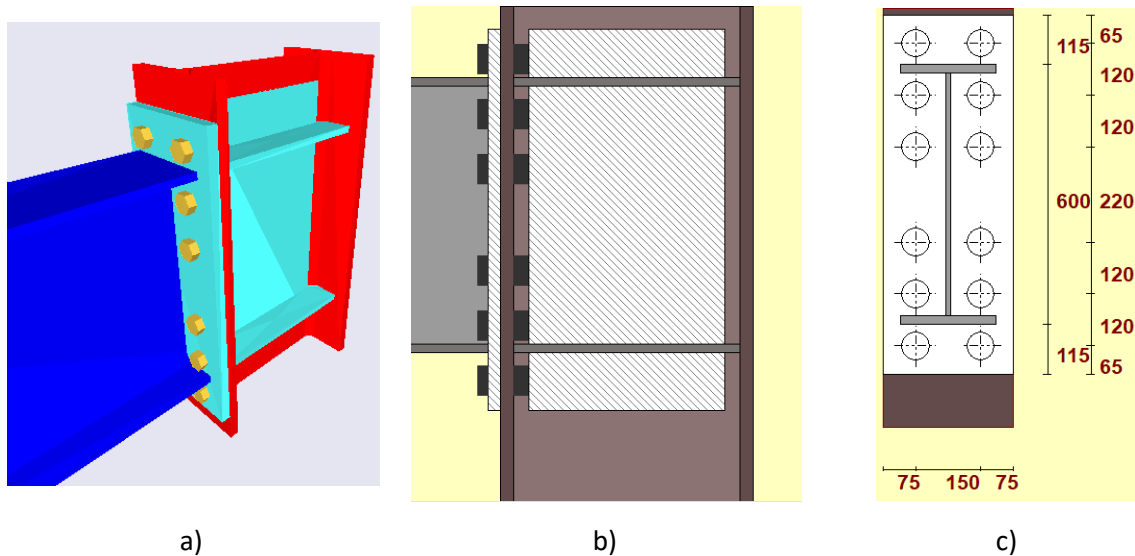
Configuration of a moment resisting joint – frames A/1, A/7 – SS/S: a) 3D view of the joint, b) side view of the joint, c) front view of the joint
